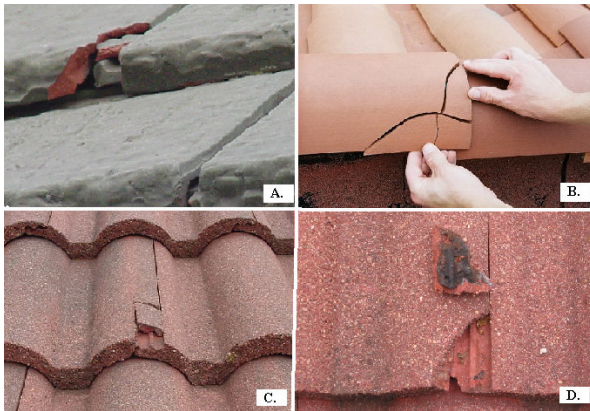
A) Location 58-Multiple fracture at corner of clay tile; B) Location 76-Starburst fracture in barrel ridge tile (clay); C) Location 62-Multiple fracture in right overlap of concrete tile from hail impact; D) Location 19-Right corner fracture in concrete tile that had been repaired previously (prior to hailstorm).
